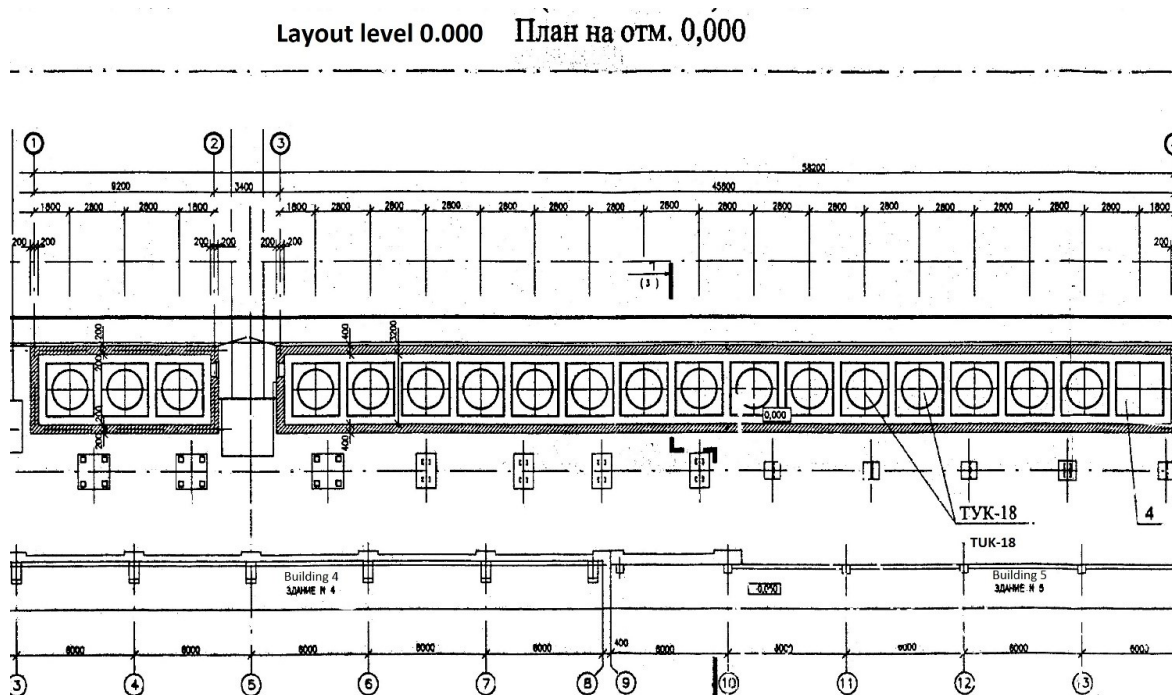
Site plan of the accumulation pad at FSUE Atomflot.
